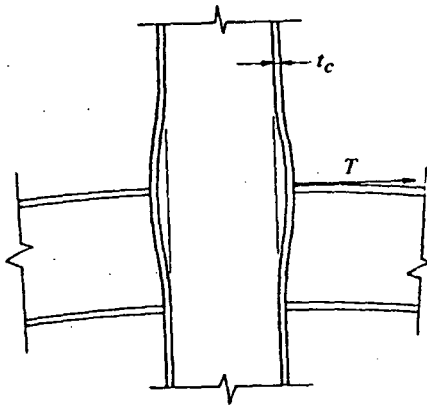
BENDING OF COLUMN FLANGES DUE TO TENSILE FLANGE FORCE
